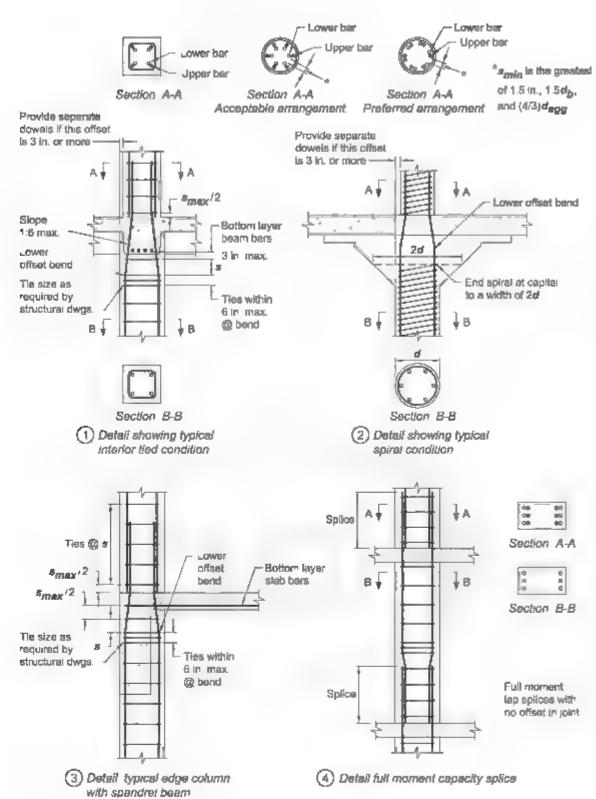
2 2b-Column splice details (ACI 315-99)
